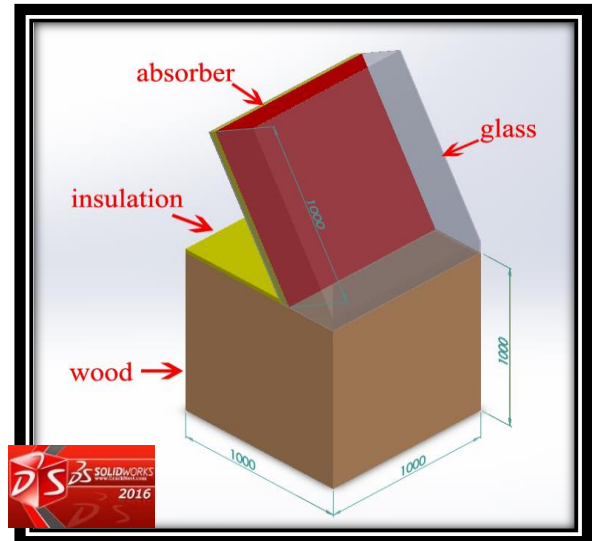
Roof solar chimney with inclination 60° (all dimensions in mm)
